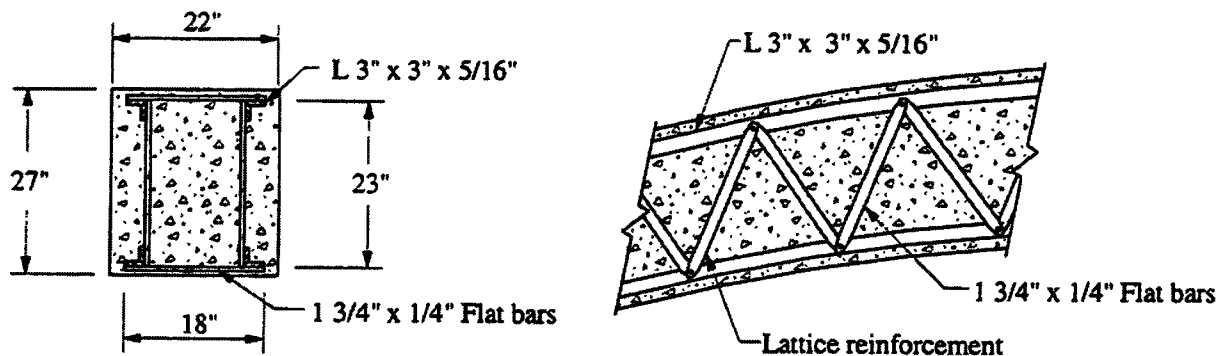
Bridge II: Configuration and reinforcing details of hangers.
